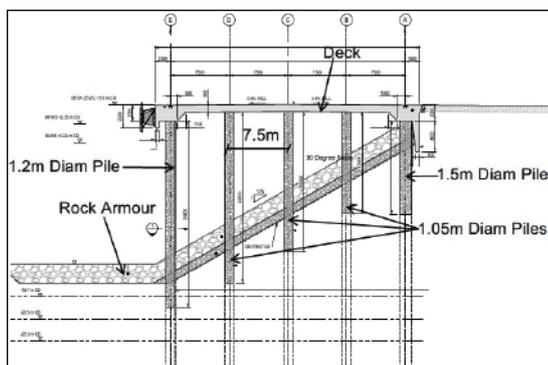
Cross-section through the reclamation at the location of the wharf and concept details of the future works
